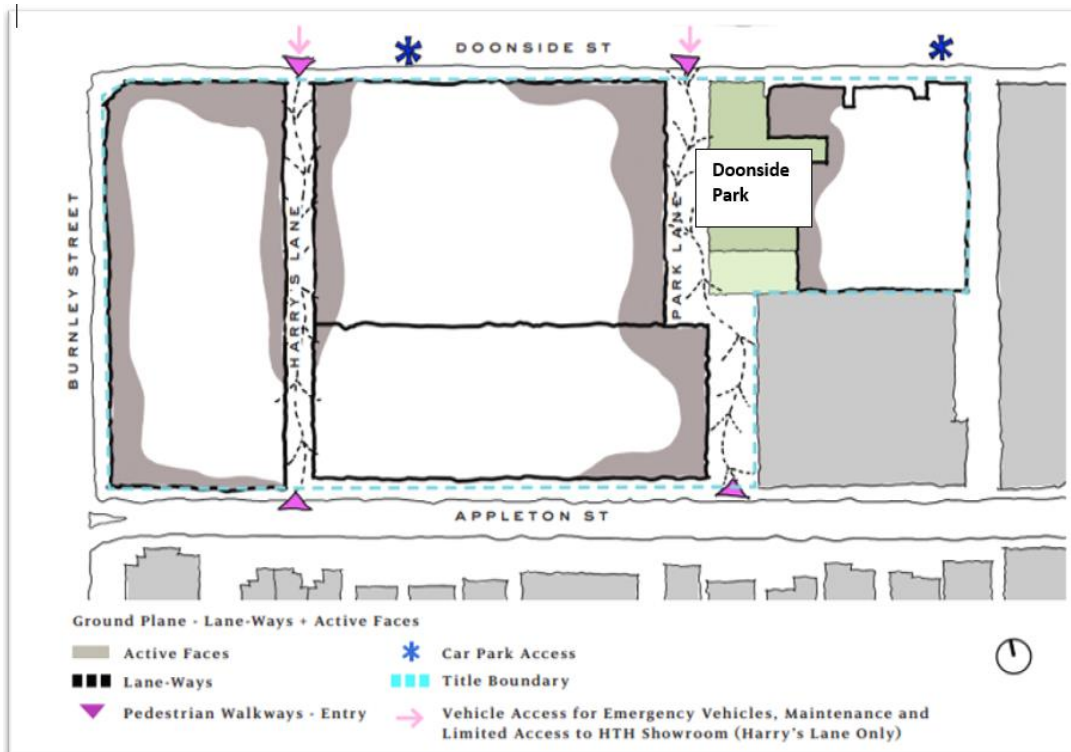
Ground floor layout. Source: Development Plan (Gurner 2023)
